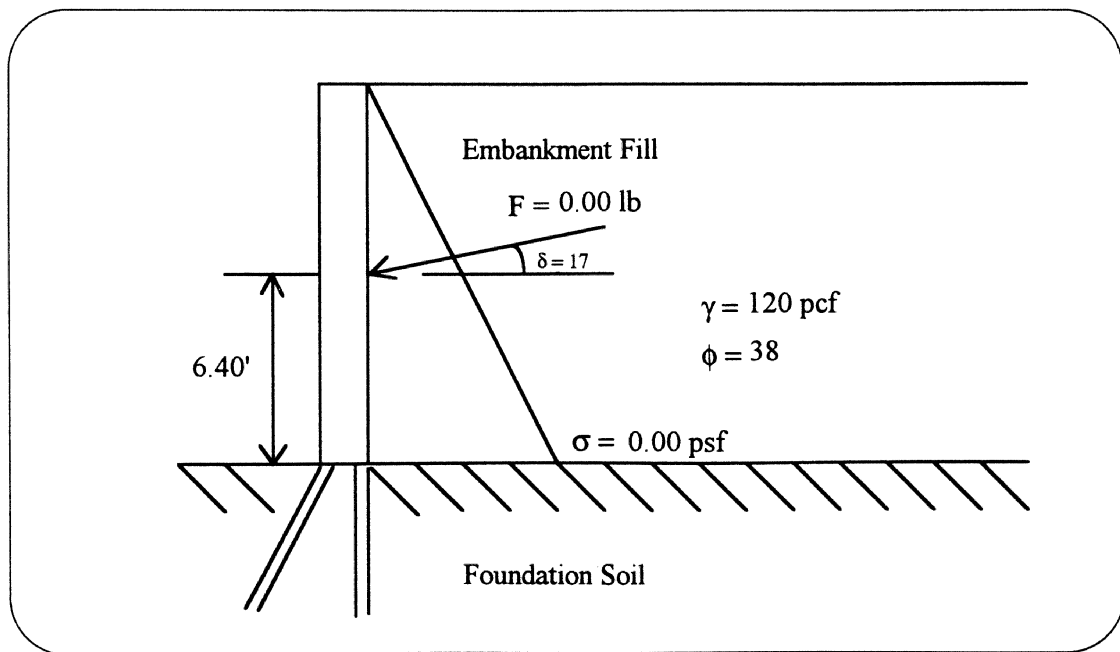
Lateral Earth Pressure, South Abutment Bridge B
